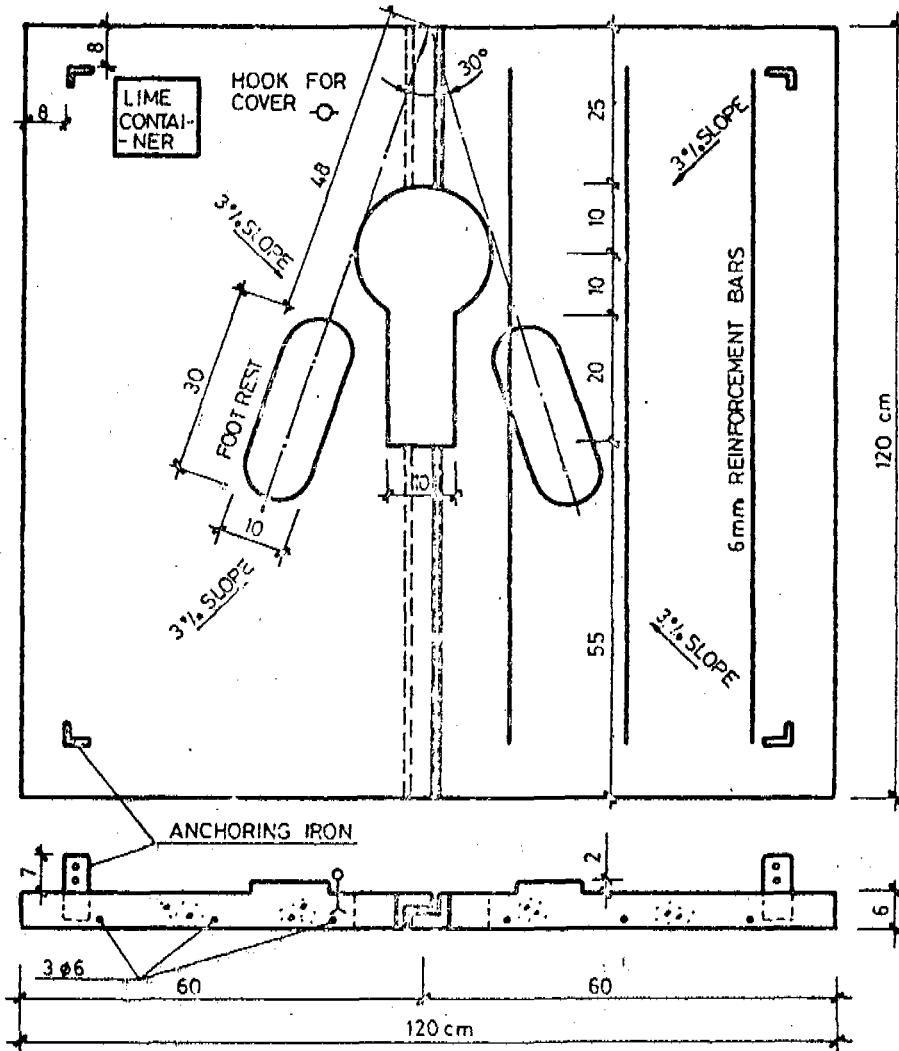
PLAN OF A PIT LATRINE CONCRETE SLAB
